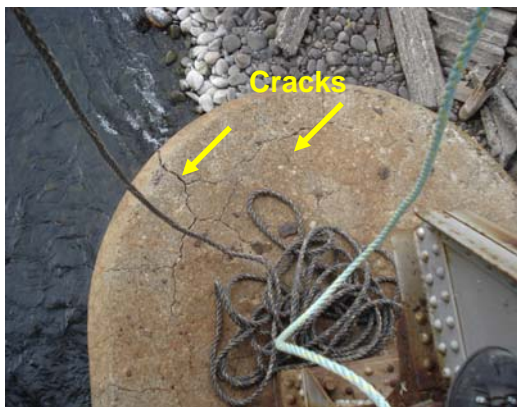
Cracks in Pier Cap of Pier 4
